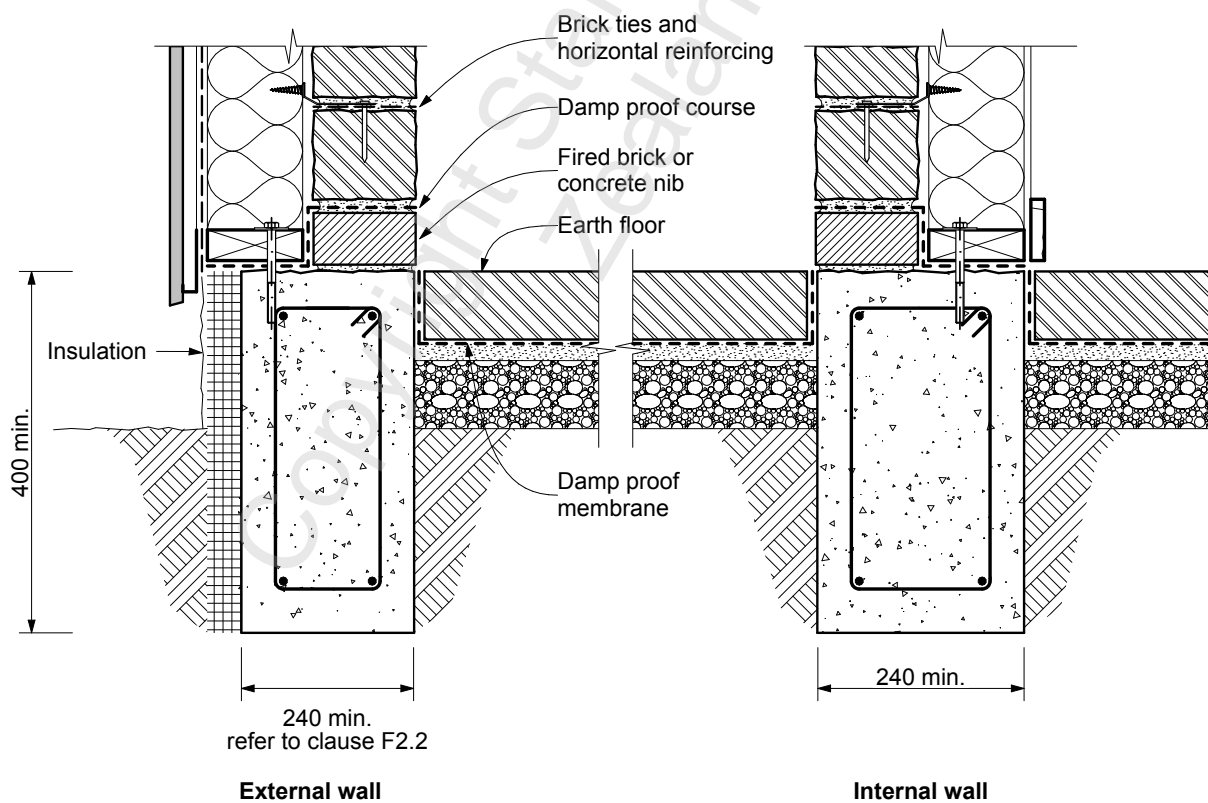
Footing – Internal adobe veneer, concrete raft foundation
